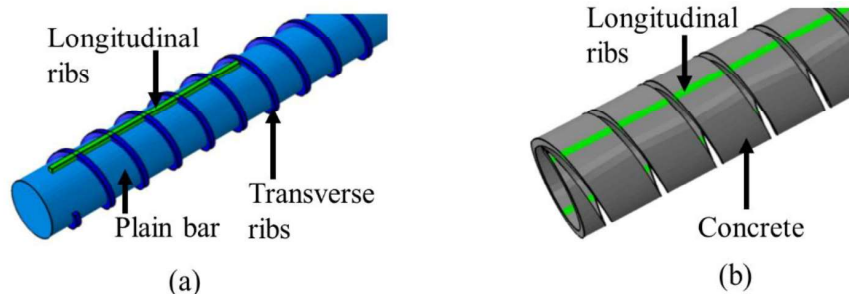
Numerical modelling of (a) ribbed rebar and (b) concrete within ribs of rebar
